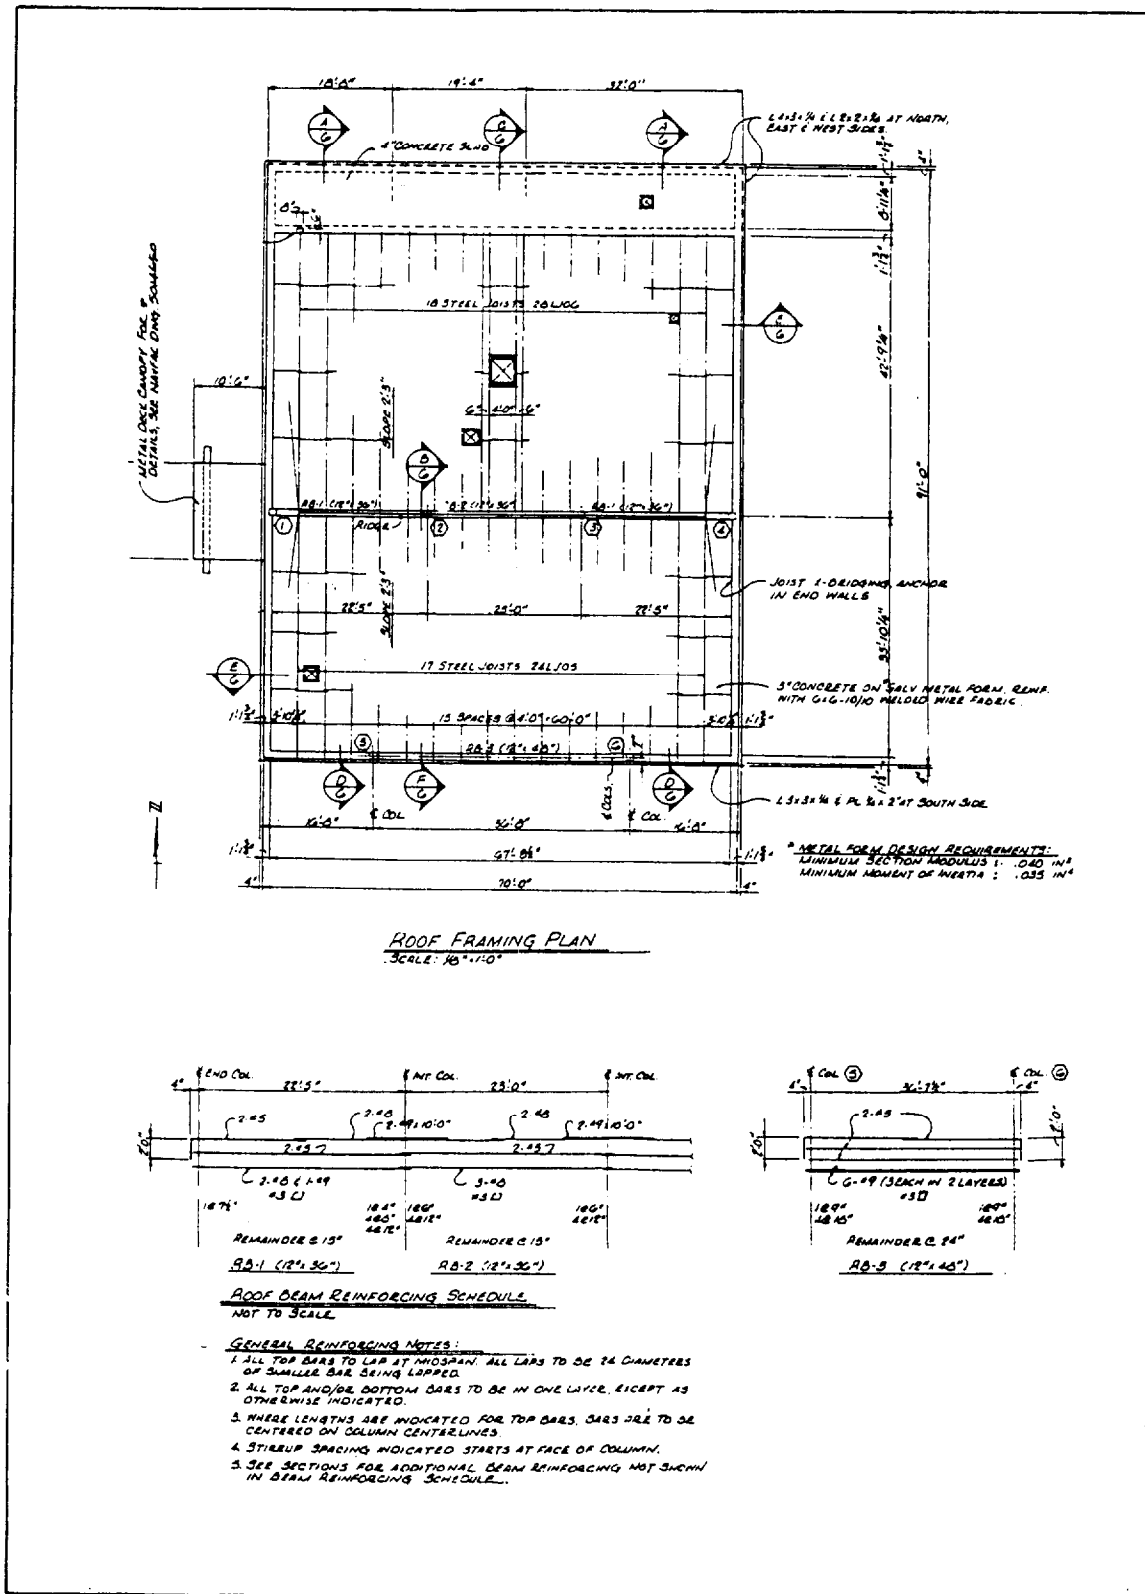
Example of a structural roof framing plan for a precast or a cast-in-place concrete construction.
